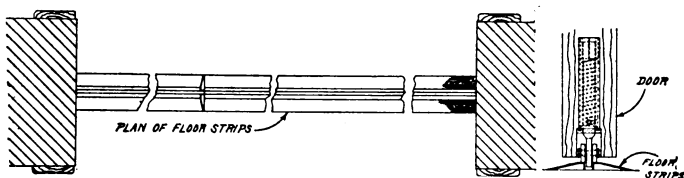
HORIZONTAL AND VERTICAL SECTIONS SHOWING TYPE OF FLOOR GUIDES OFTEN USED
